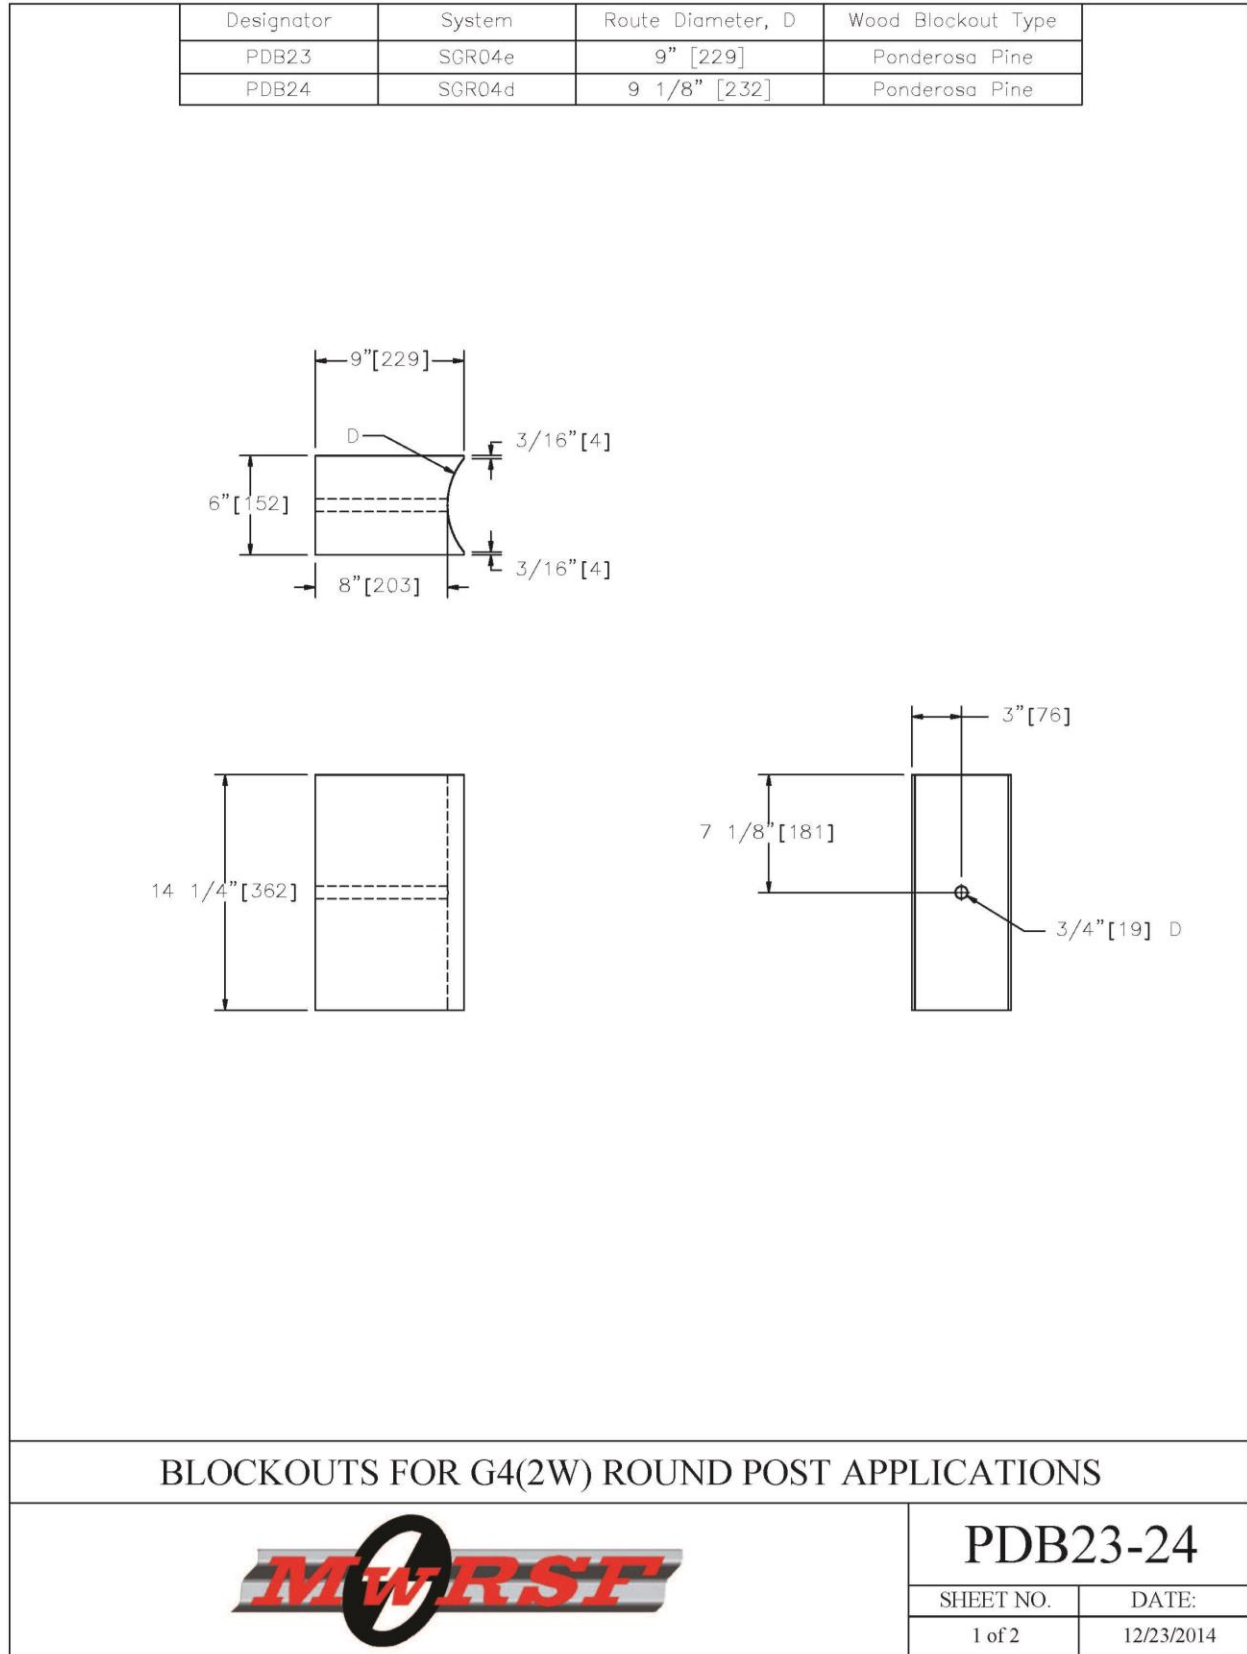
Blockouts for G4(2W) Round Post Applications, Sheet 1
